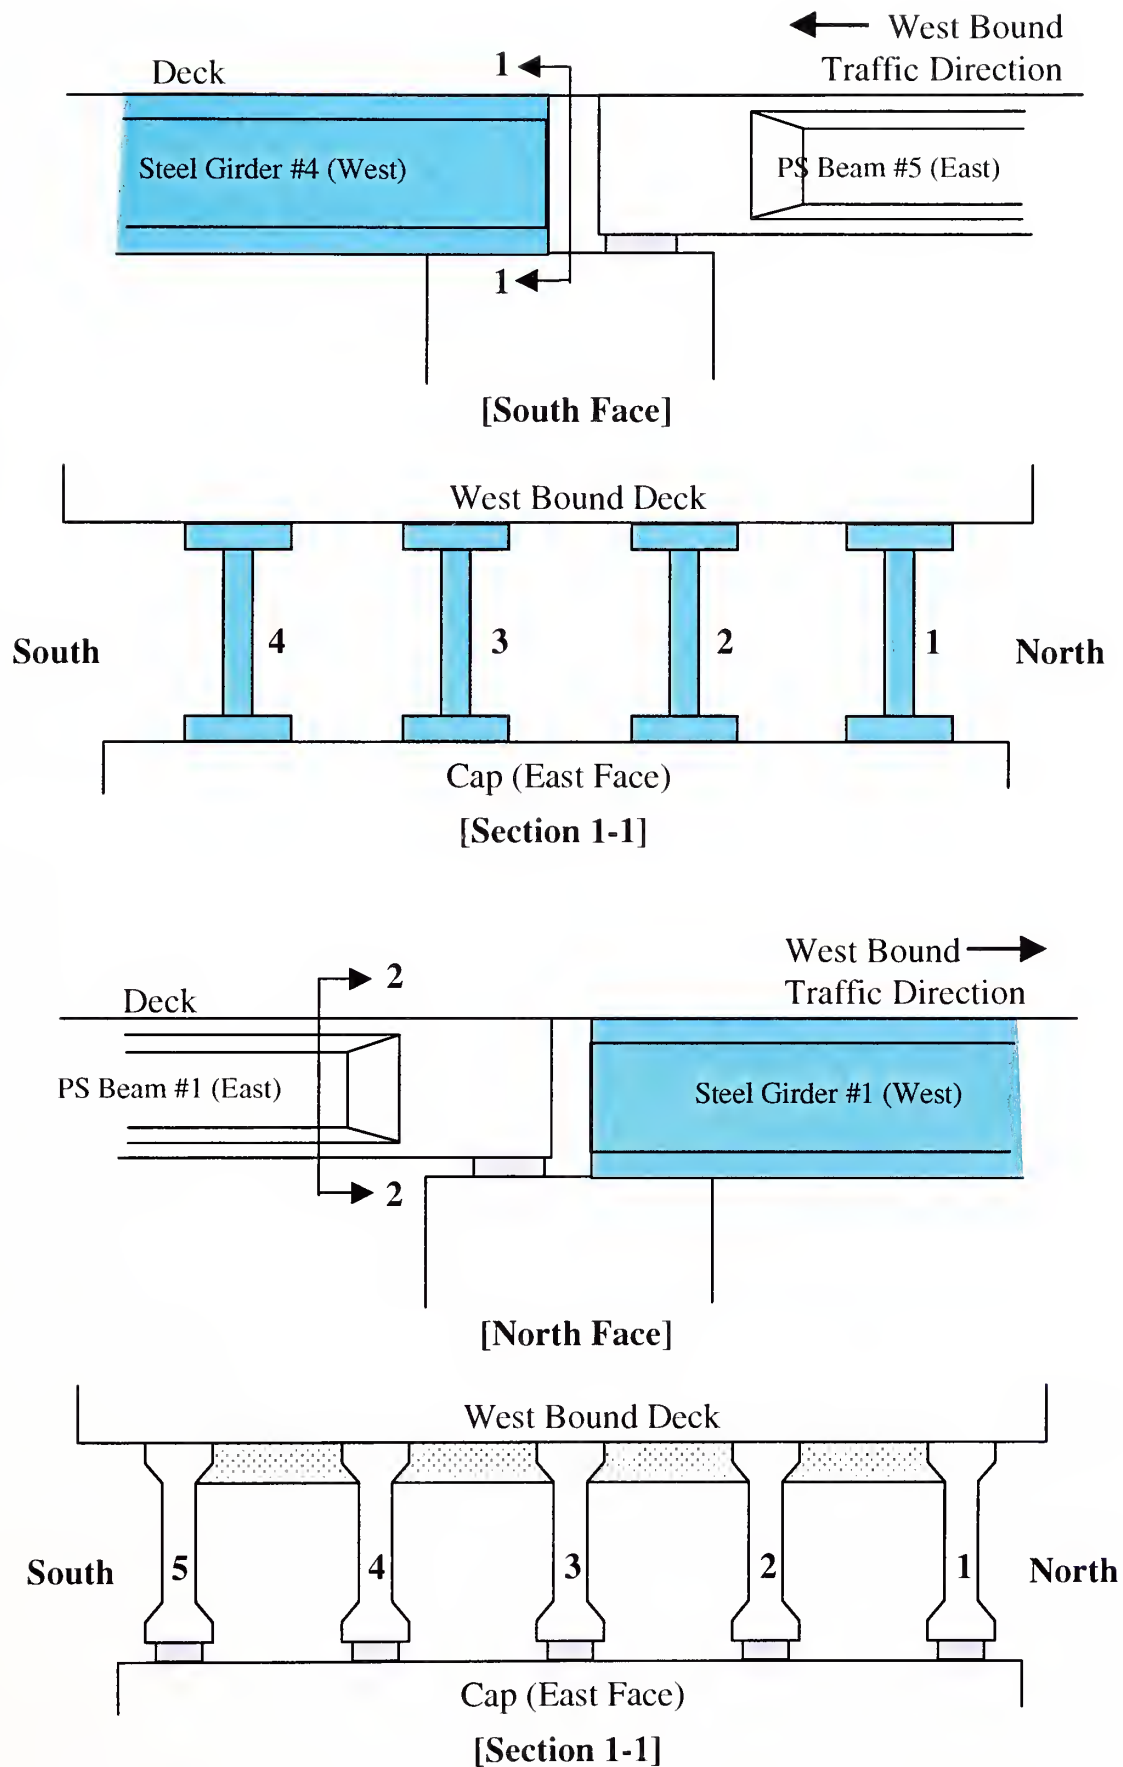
B. Condition of Girder Joints over Bent No. 13 (West Bound).
